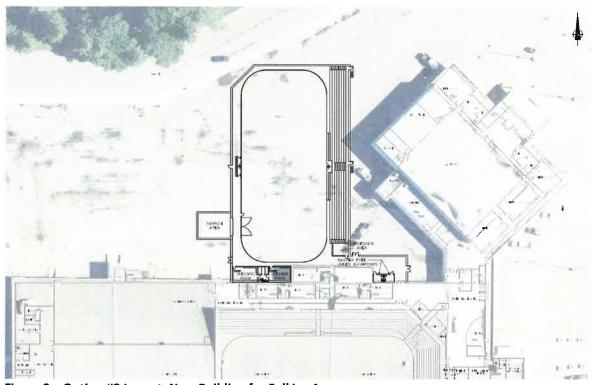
Option #3 Layout: New Building for Full Ice Arena
